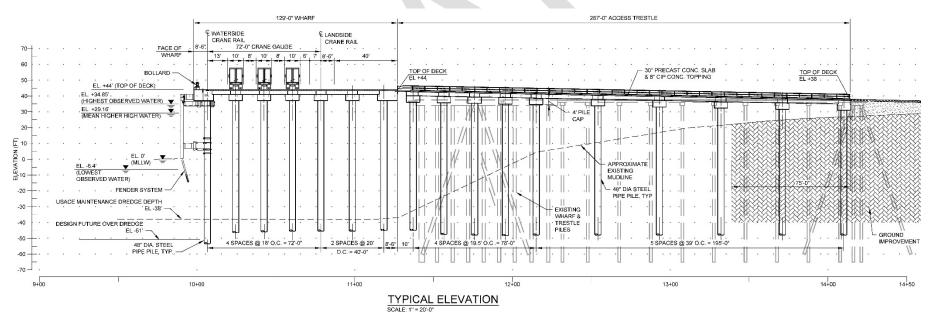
Longitudinal Elevation for Terminal 1 Access Trestle: Alternative 1A with 48-inch-diameter Driven Piles
